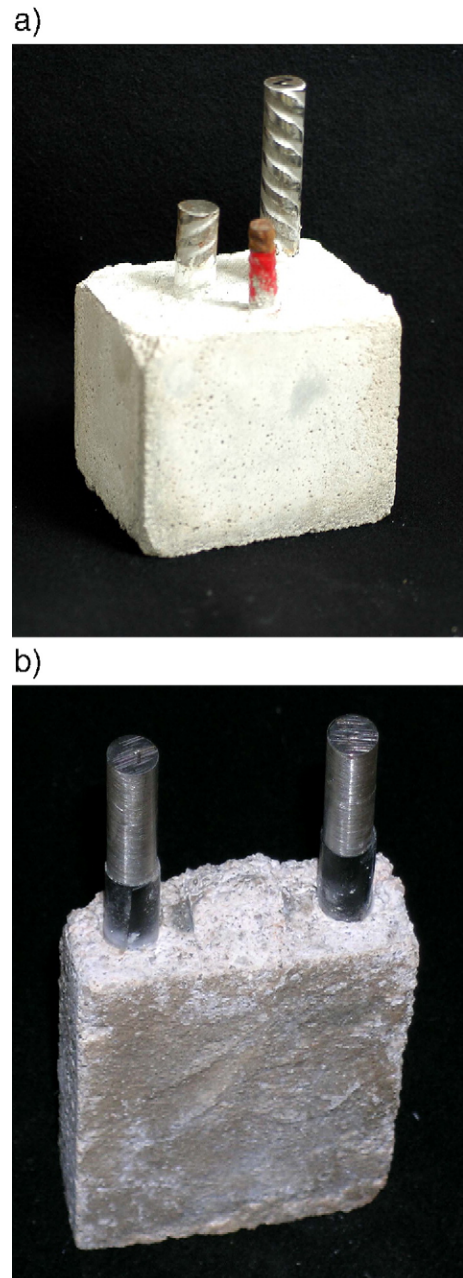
Photograph of a small mortar specimen used to test ribbed rebars of: a) carbon steel and welded and non-welded HSS3 stainless steel; b) AISI 304, AISI 316, HSS1 and HSS2.
